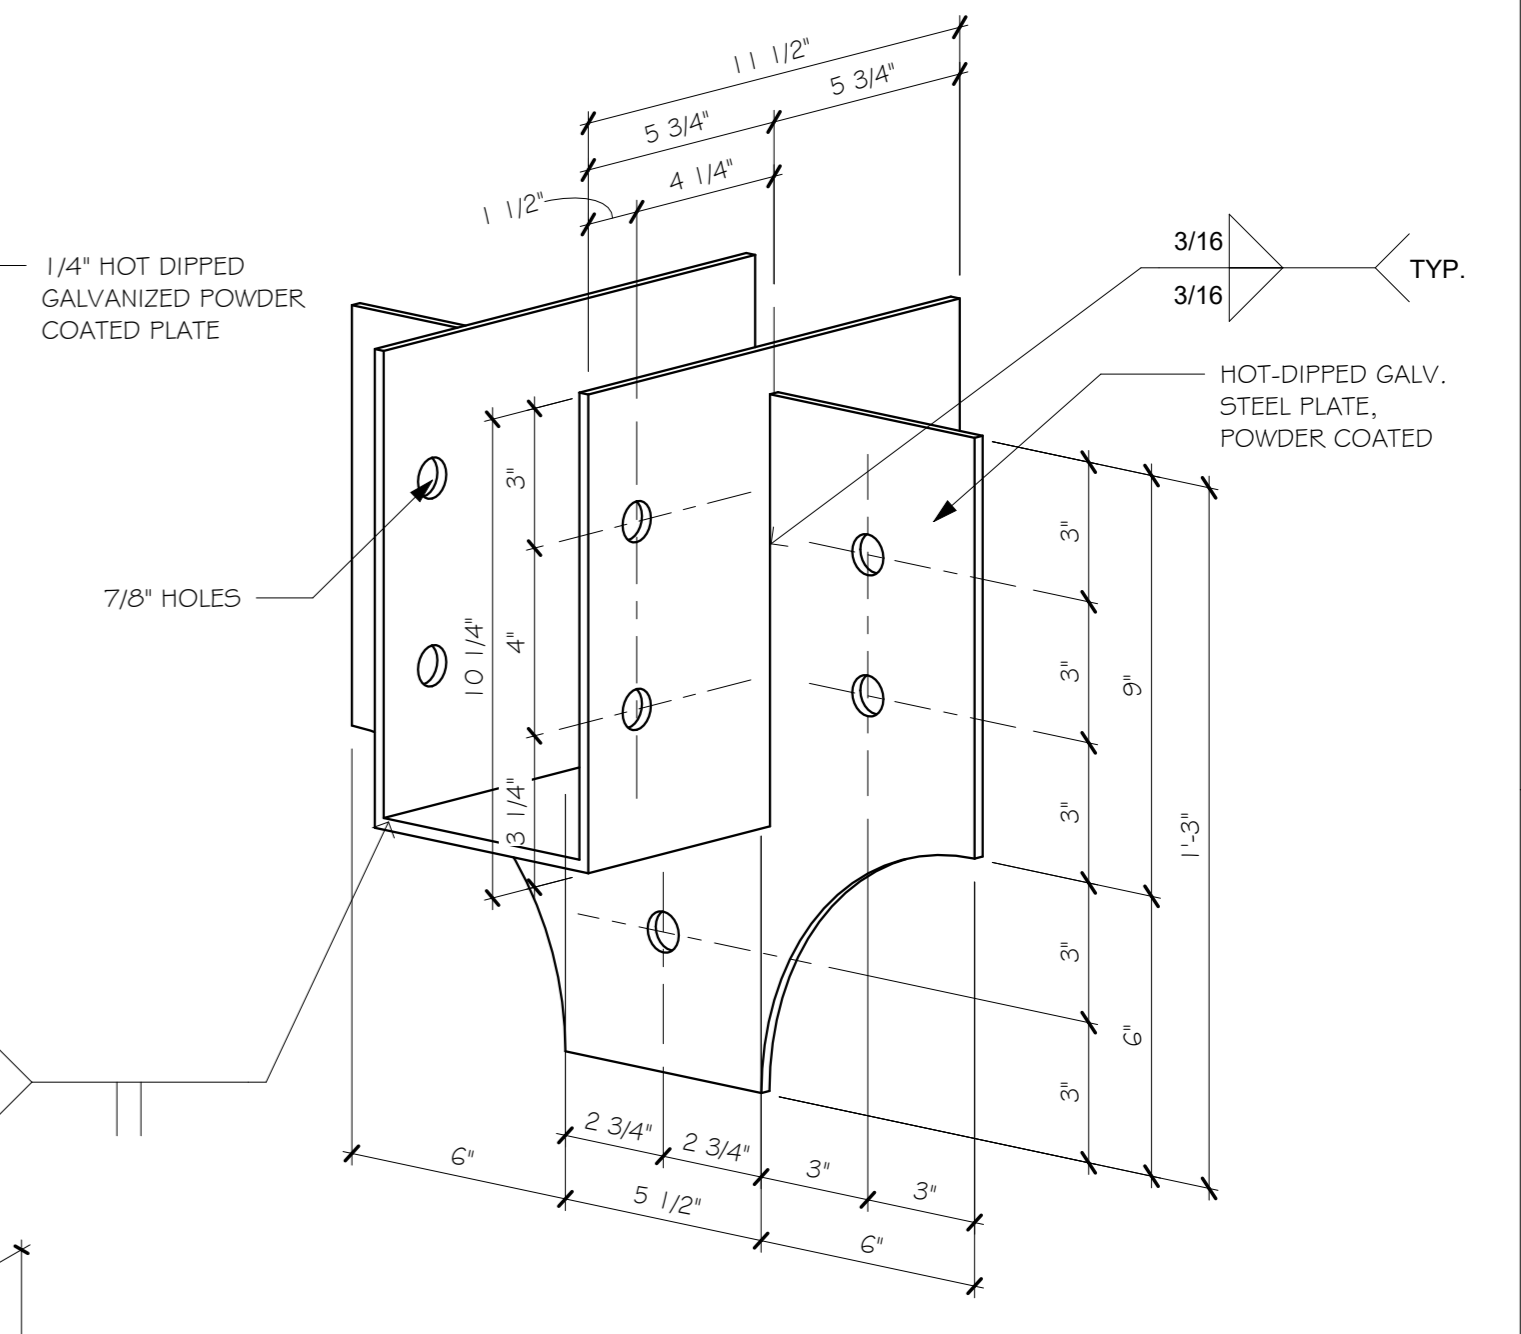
FRONT PORCH COLUMN DETAIL
